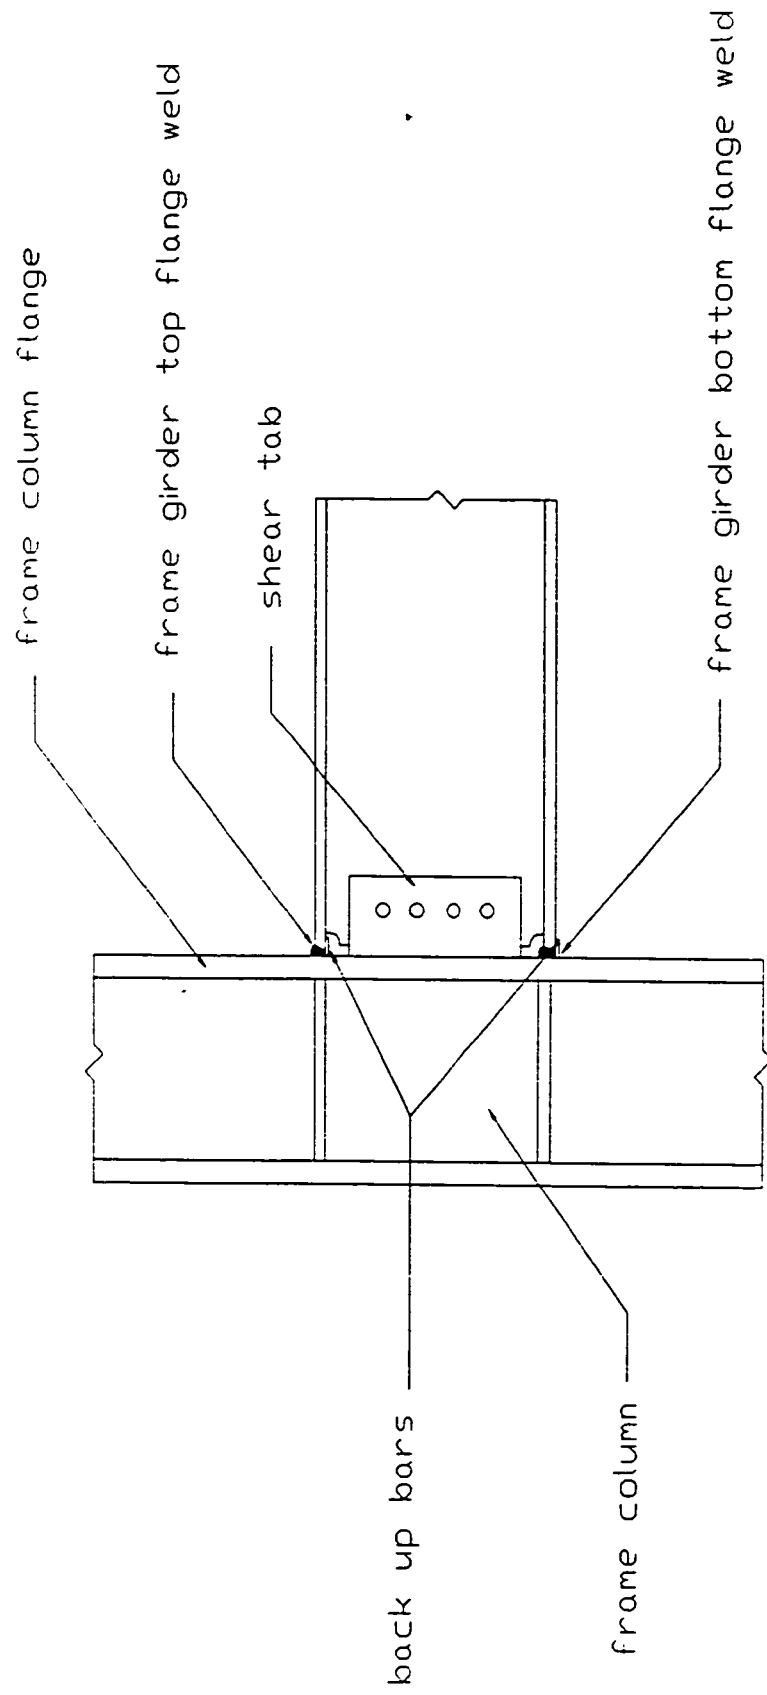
Typical Bolted Web Welded Flange Moment Connection
